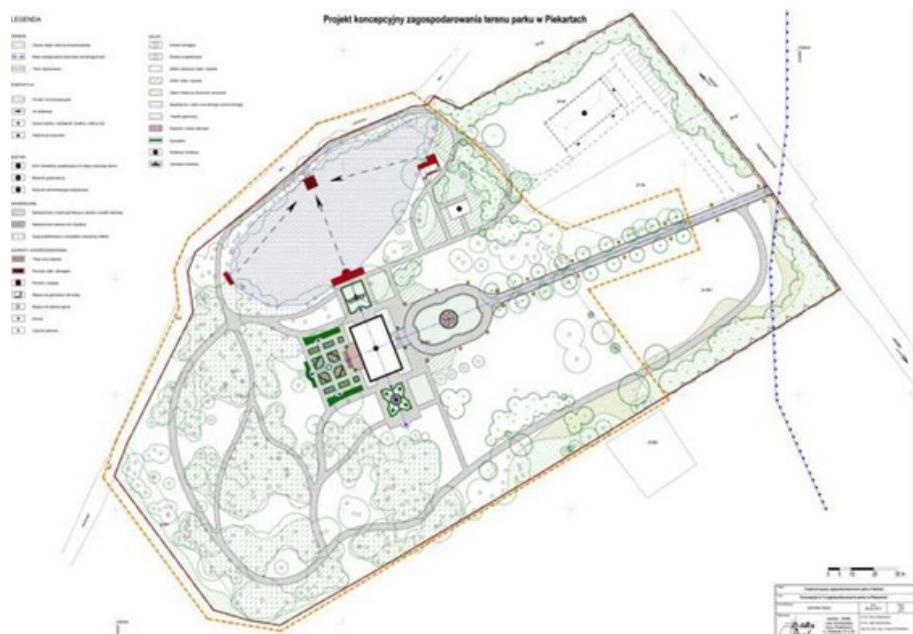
Design plan featuring a new building on the site of the manor house (aligned with the access avenue); the former schoolhouse is not preserved
